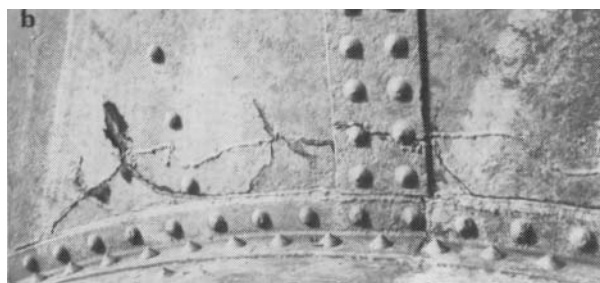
Fatigue crack at tack weld on a riveted member
